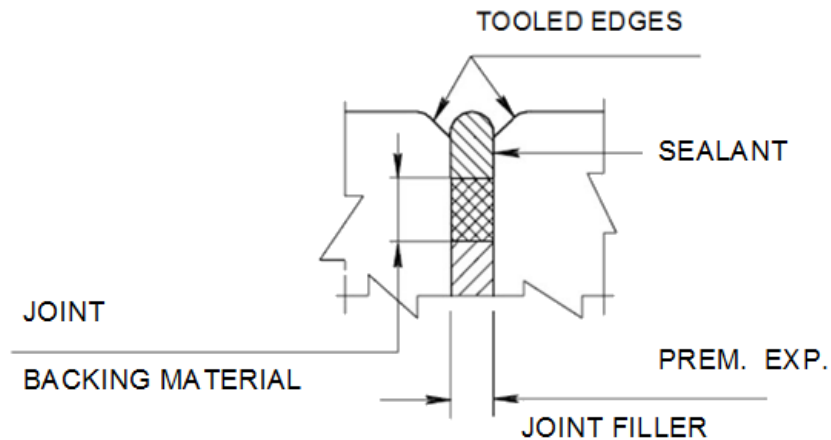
Cross Section of a Pourable Joint Seal
